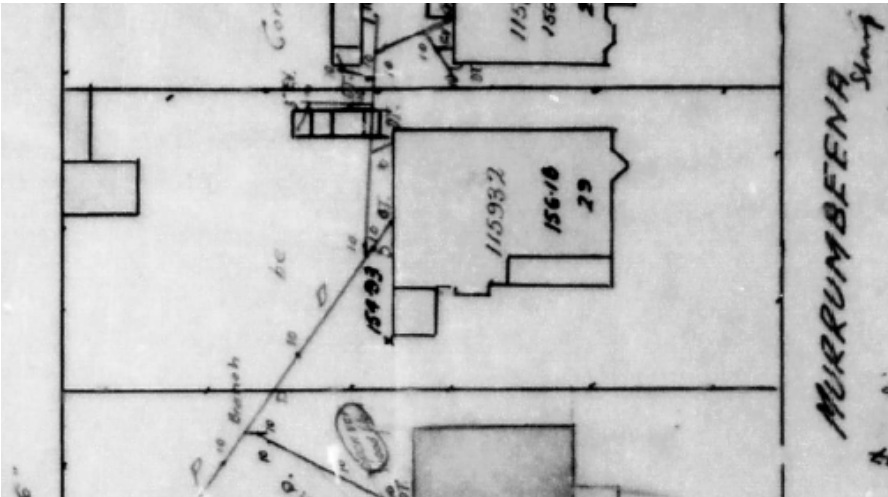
Plan of the subject site dated August 1928, showing a footprint of the house and outbuildings, annotated with sewerage works (Source: SEW, Drainage Plan No. 115966)
